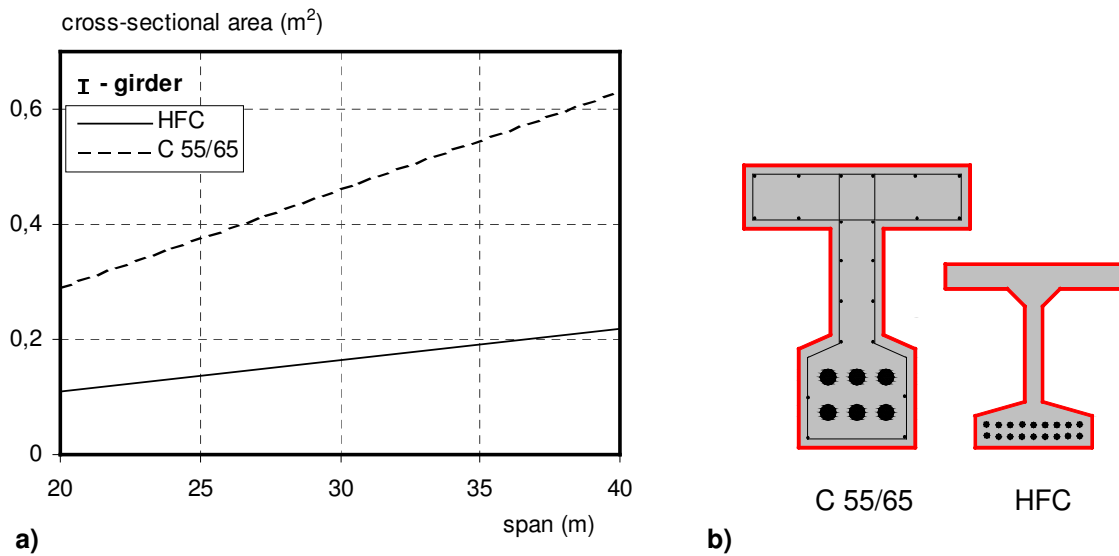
a) The relation between span and cross-sectional area of I girders made of Hybrid-Fibre Concrete (HFC) and of conventional reinforced concrete C 55/65; b) The scheme of the cross-sections of girders in HFC and C55/65
